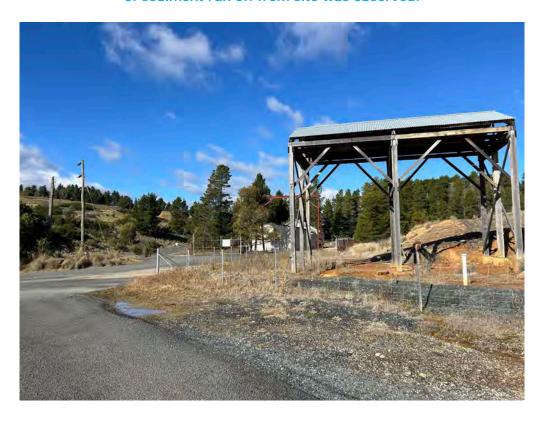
Sealed road over Copper Creek Road crossing, preventing inadvertent access to site materials underneath. Pooled water was observed.
